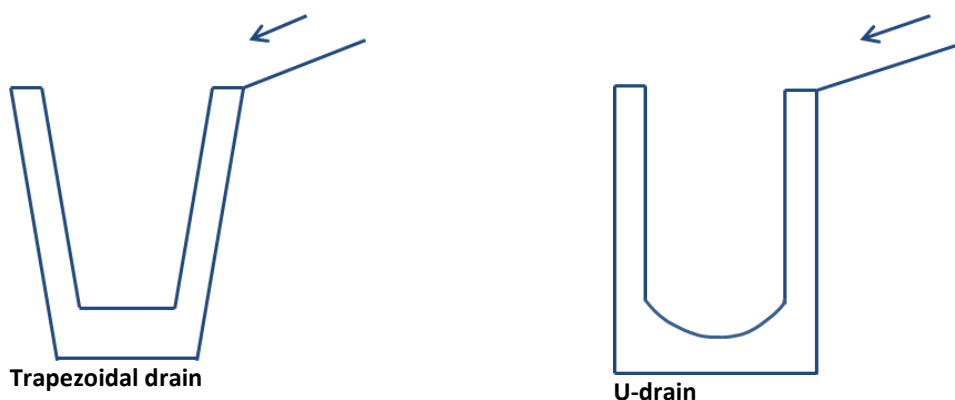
Schematic cross-sections of concrete-lined trapezoidal and U-shaped drains
